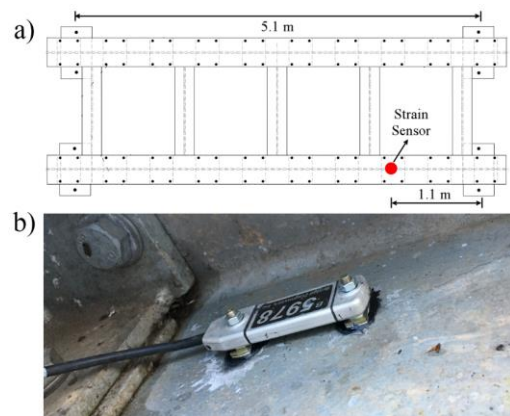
(a) Sketch of the test structure depicting sensor location, (b) strain transducer installed on the bridge.
